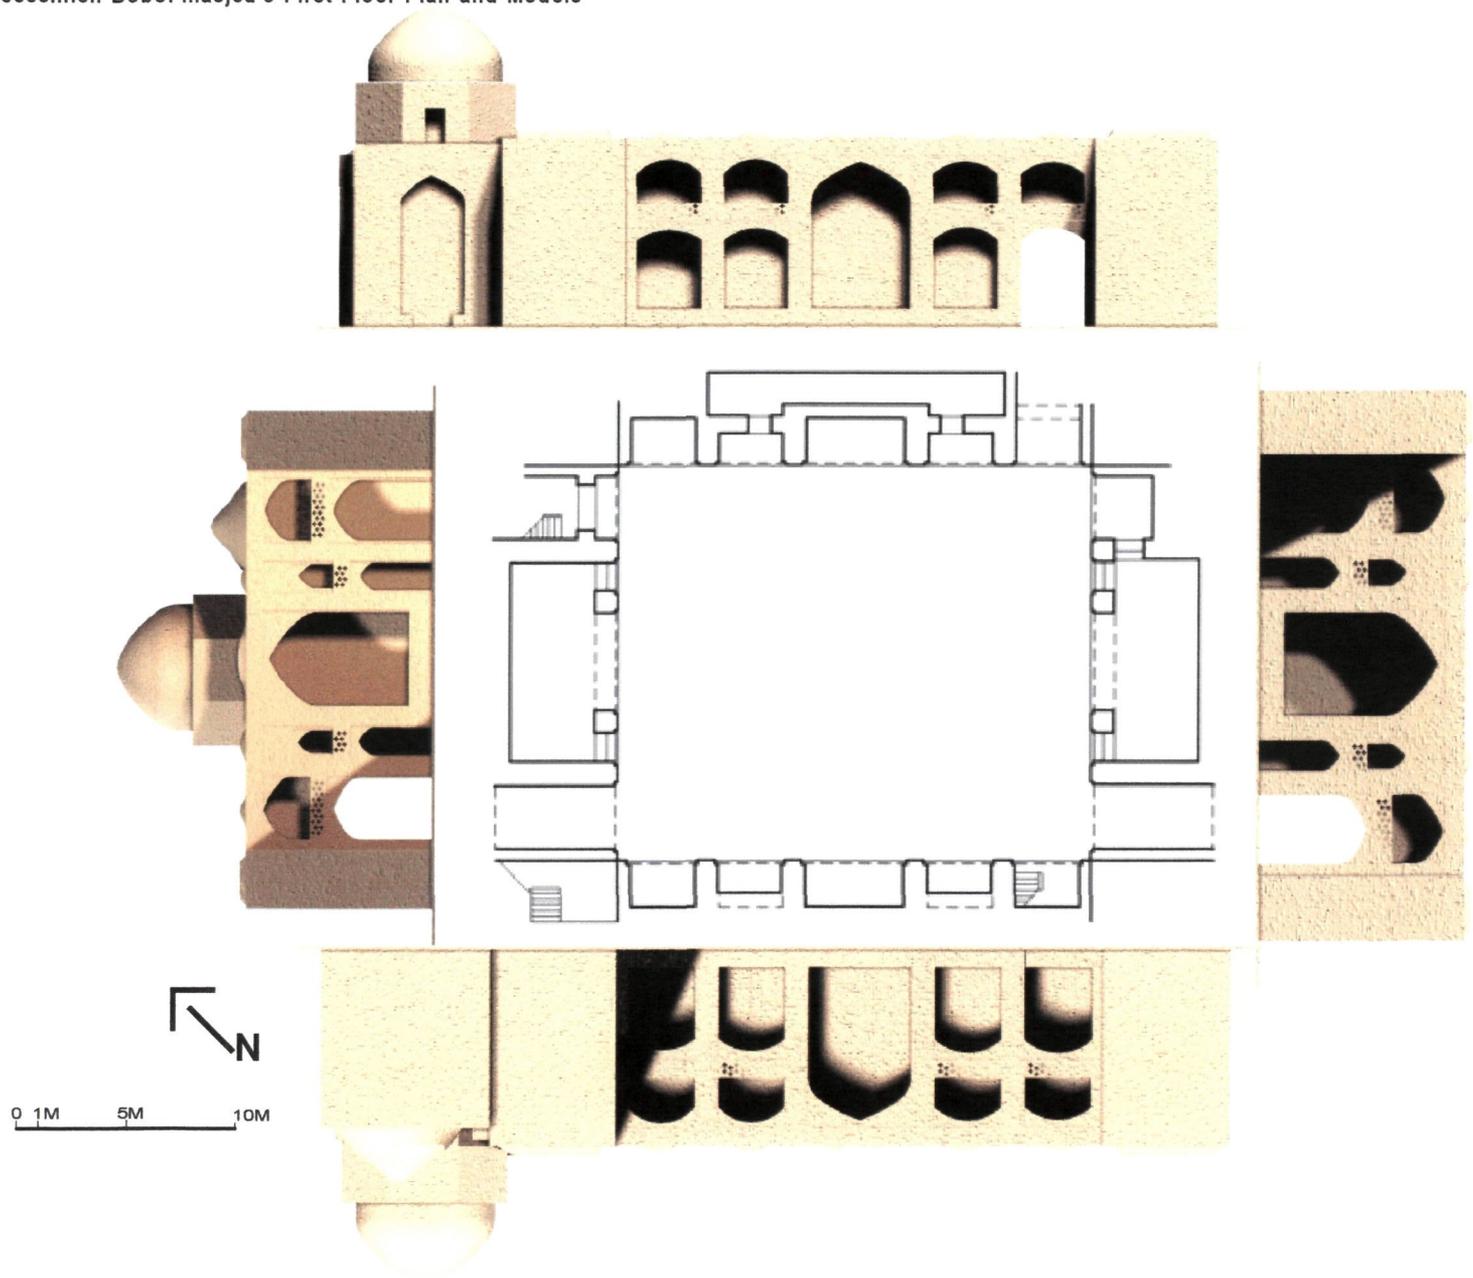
Hosseinieh Bobol masjid's First Floor Plan and Models
